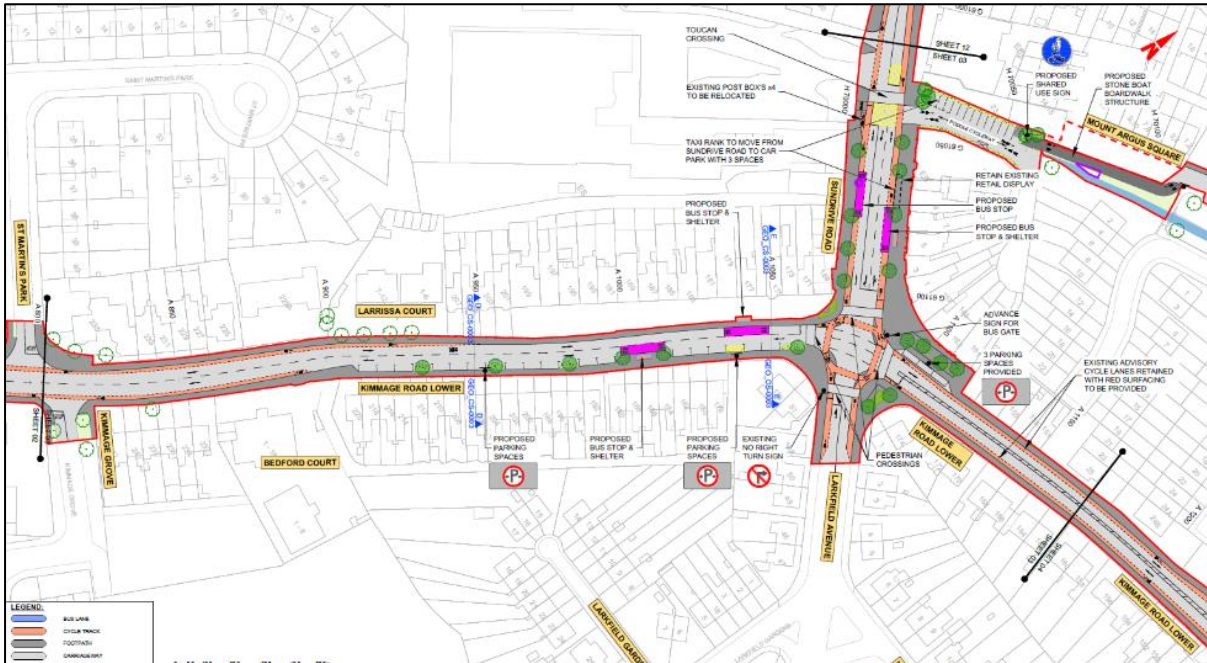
Extract from General Arrangement Drawings (Sheet 3)
